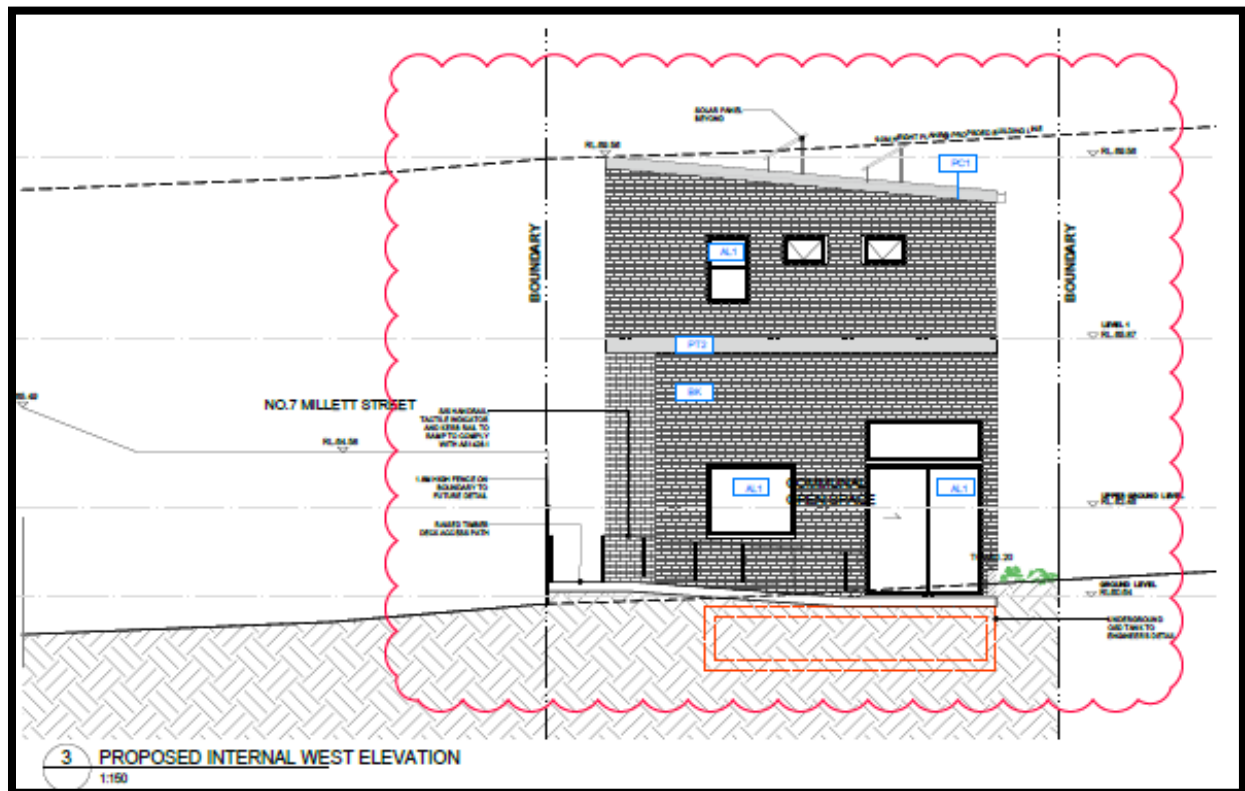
South west (rear) Elevation at 5 Millett Street Hurstville (Source – Play Co Architects)
